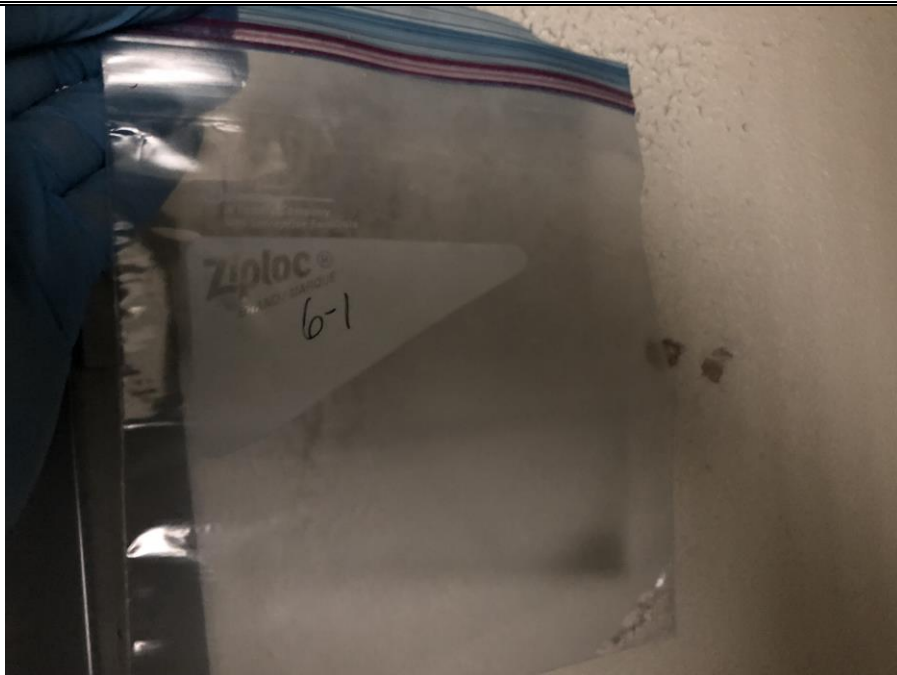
VIEW OF SAMPLED SKIM COAT PLASTER.
